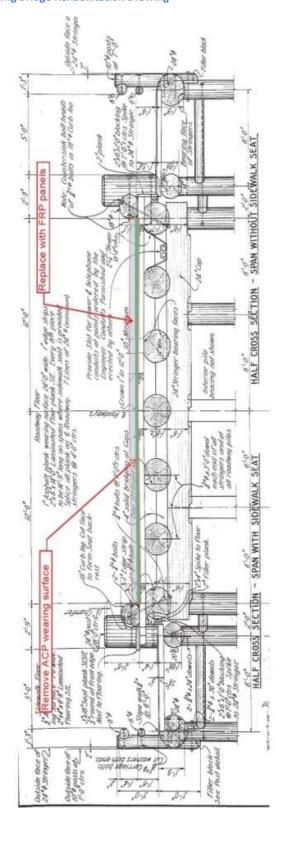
Alternative B (Expanded View, Fishing Bridge, East Side)
